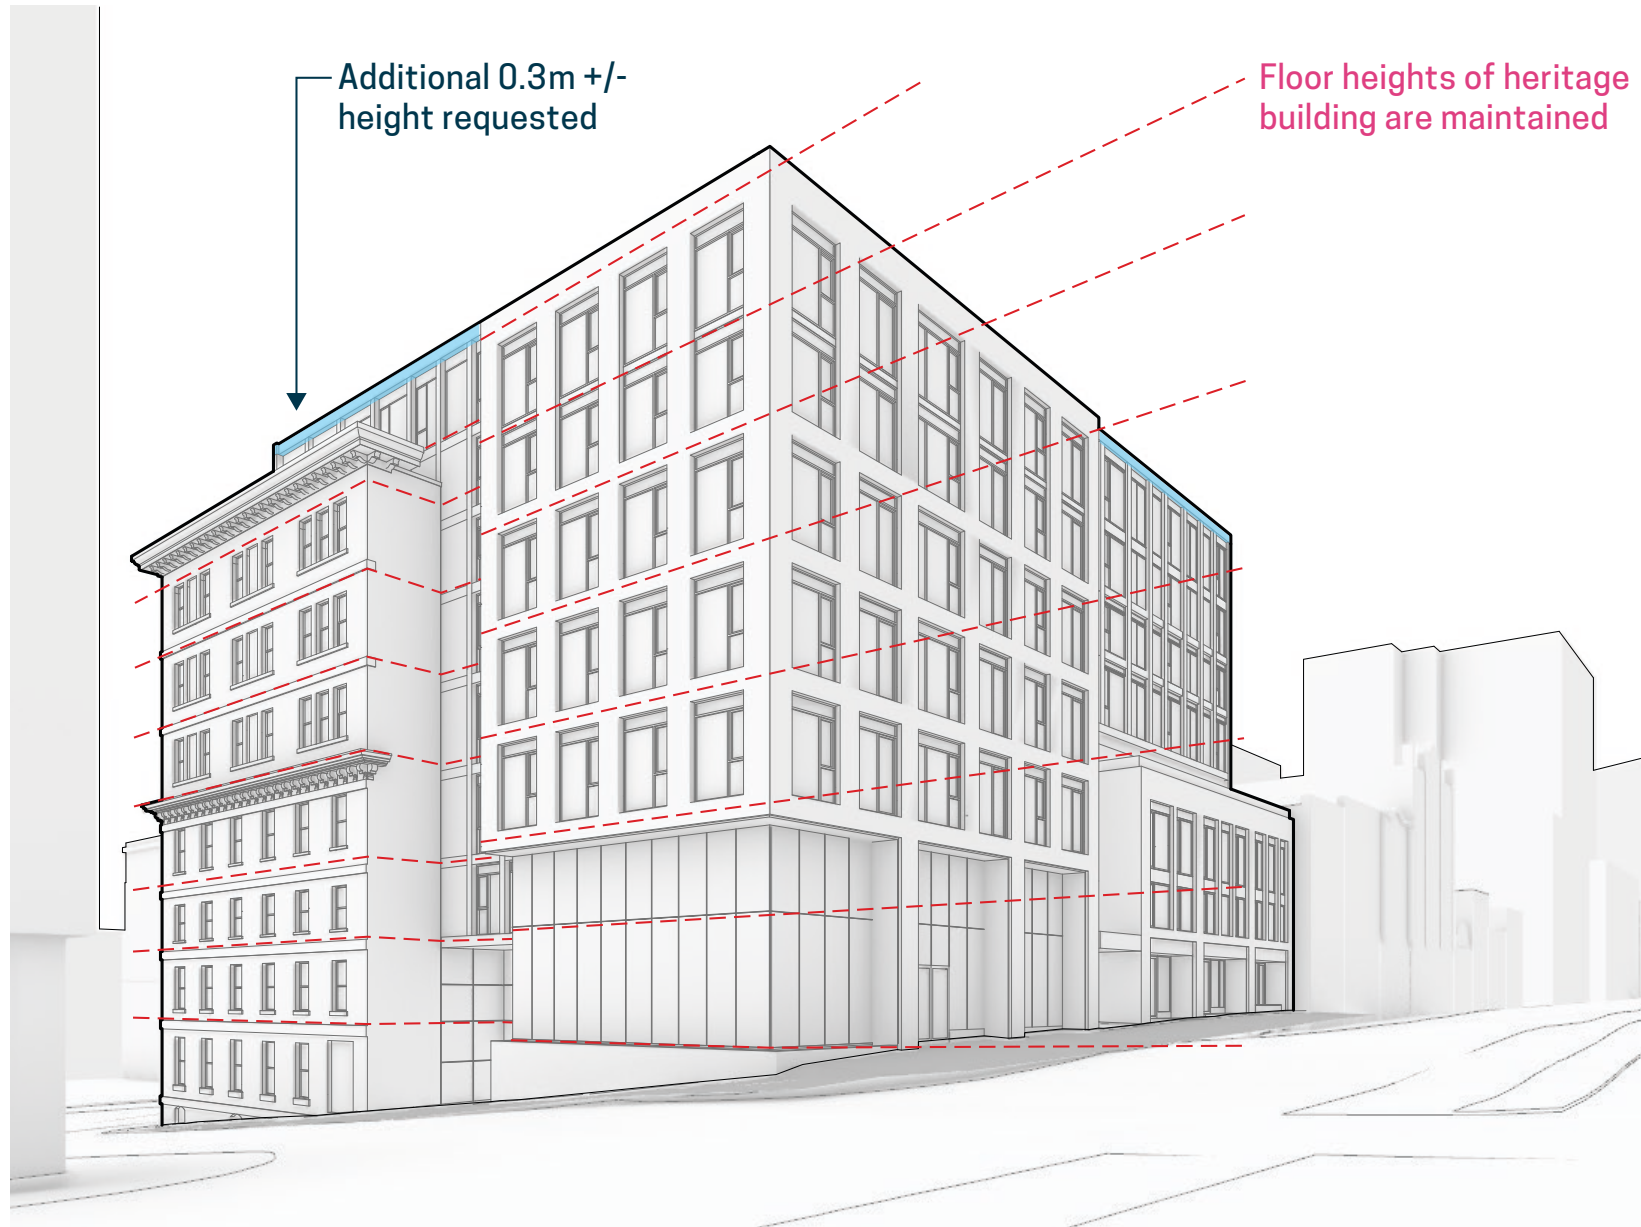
b Building Height: Floor heights of heritage building are maintained
